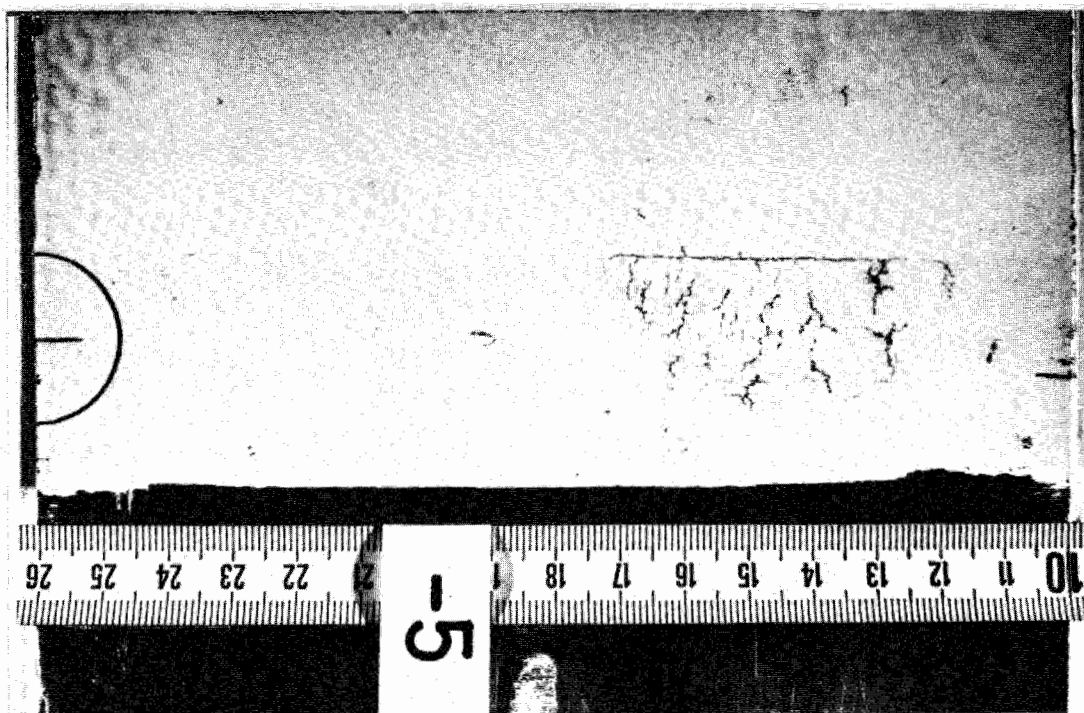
Specimen No. 5 : crack offset : + 17 mm
